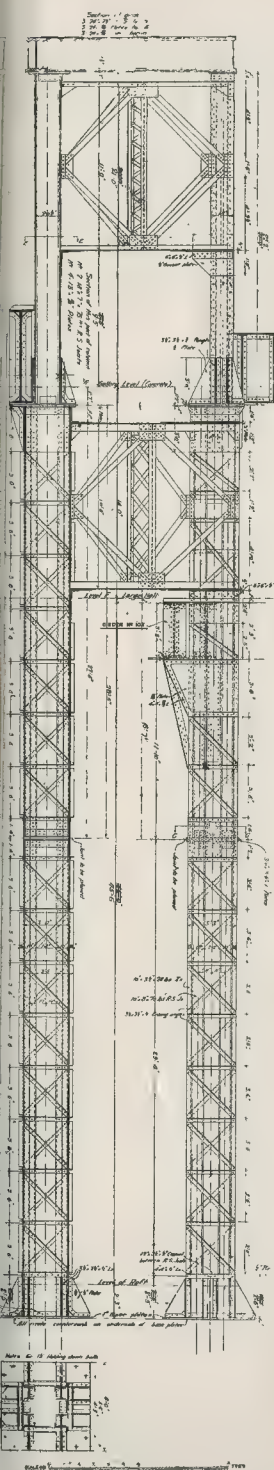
Detail of Reinforced Concrete Columns supporting Main Hall.
